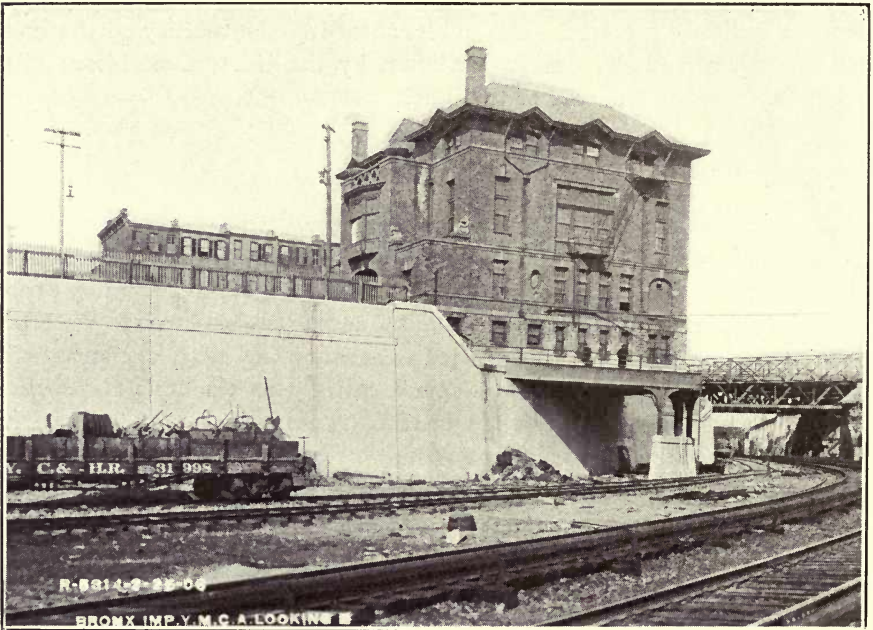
RETAINING WALL AND PROTECTION PIER, BRONX IMP., N. Y. C. & H. R. R.R.
